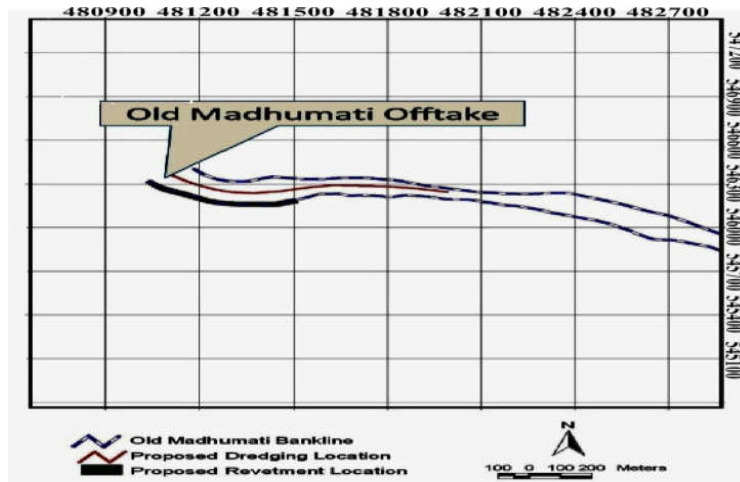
Proposed alignment of the canal at 200 m upstream from existing one
